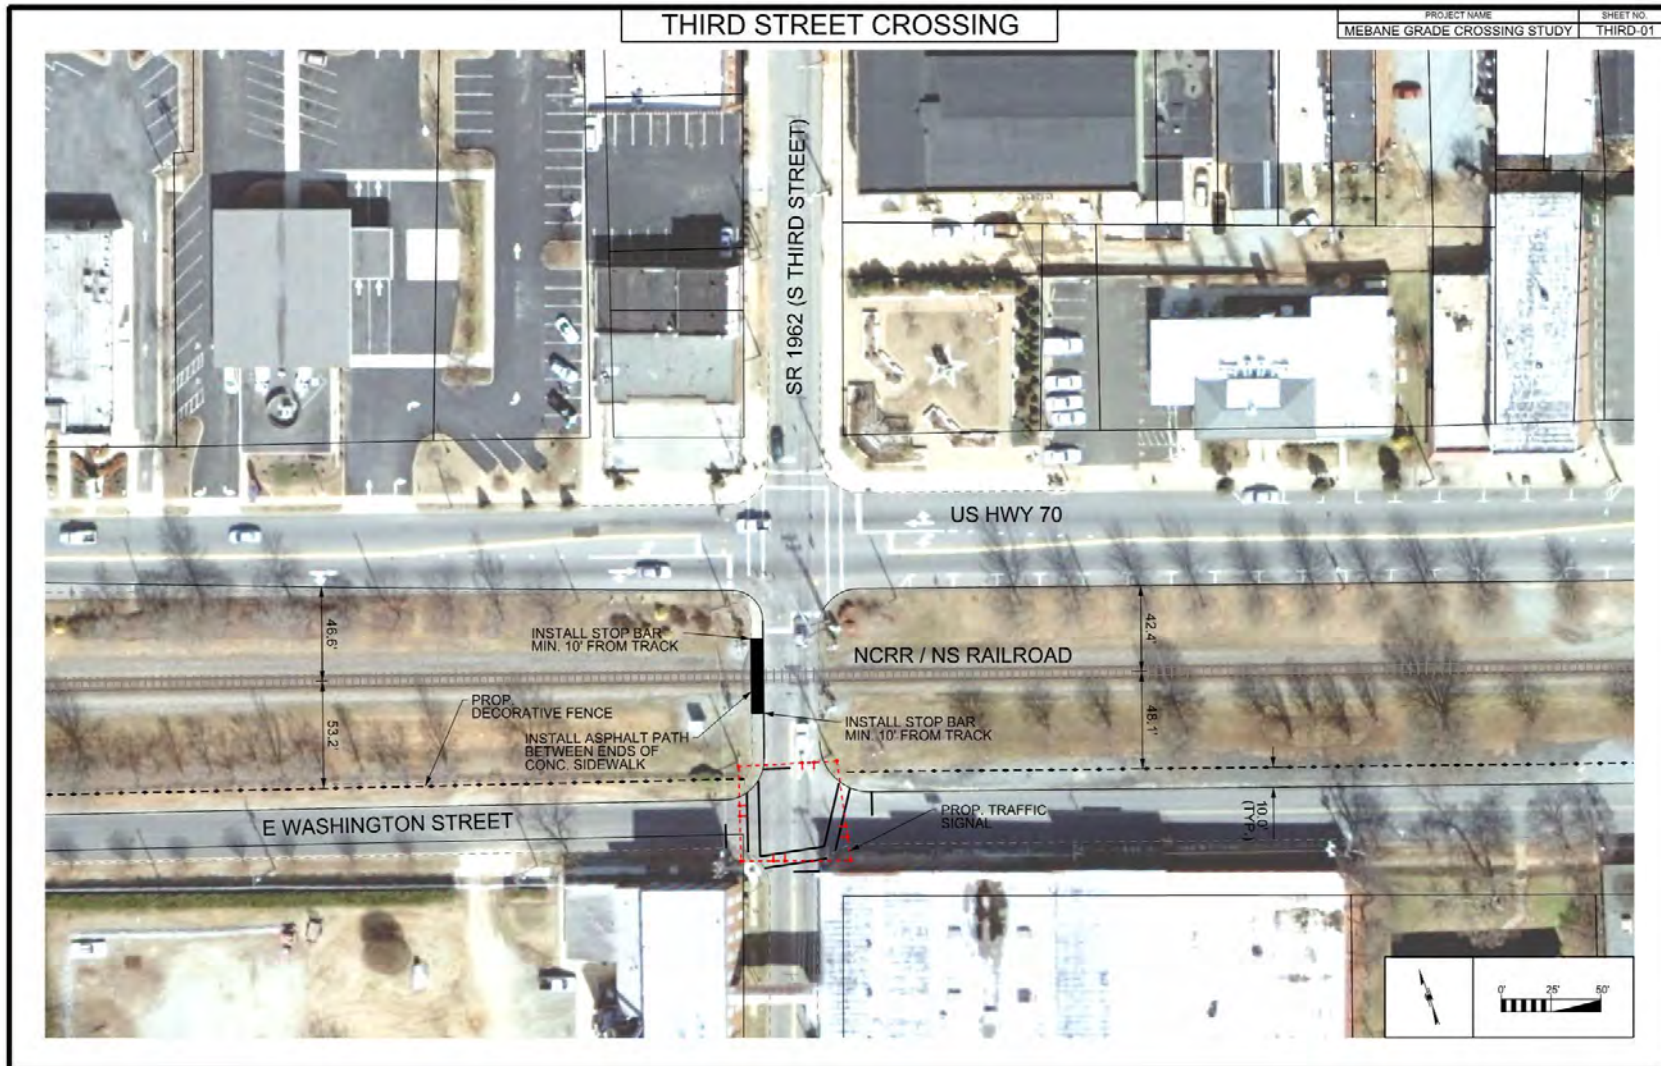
SR 1962 – 3rd Street (Crossing # 735 486V) Recommendation
